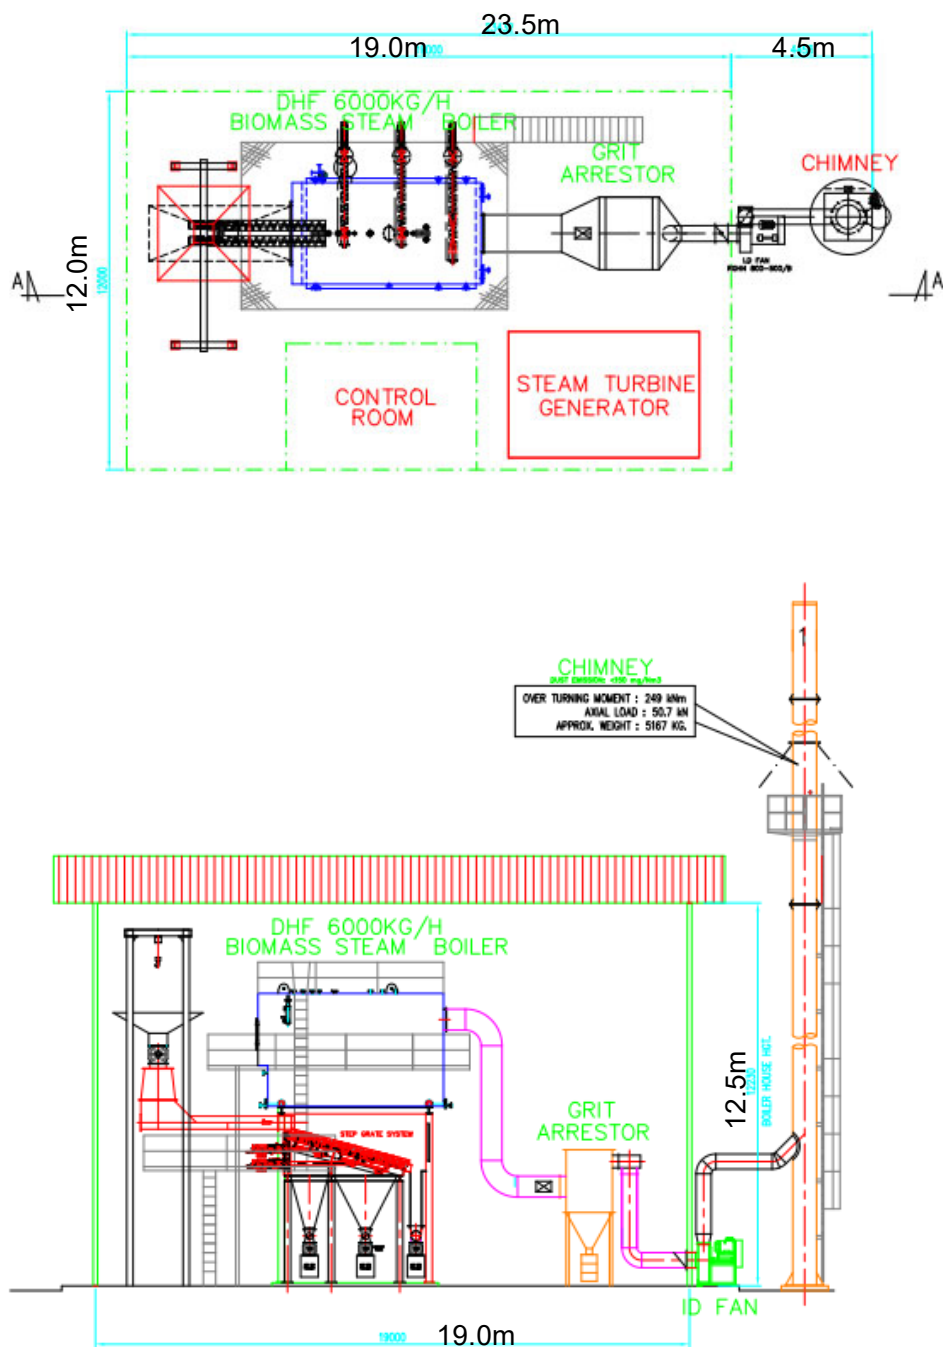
Plan and elevation of the facility (Direct combustion style 500kW)
